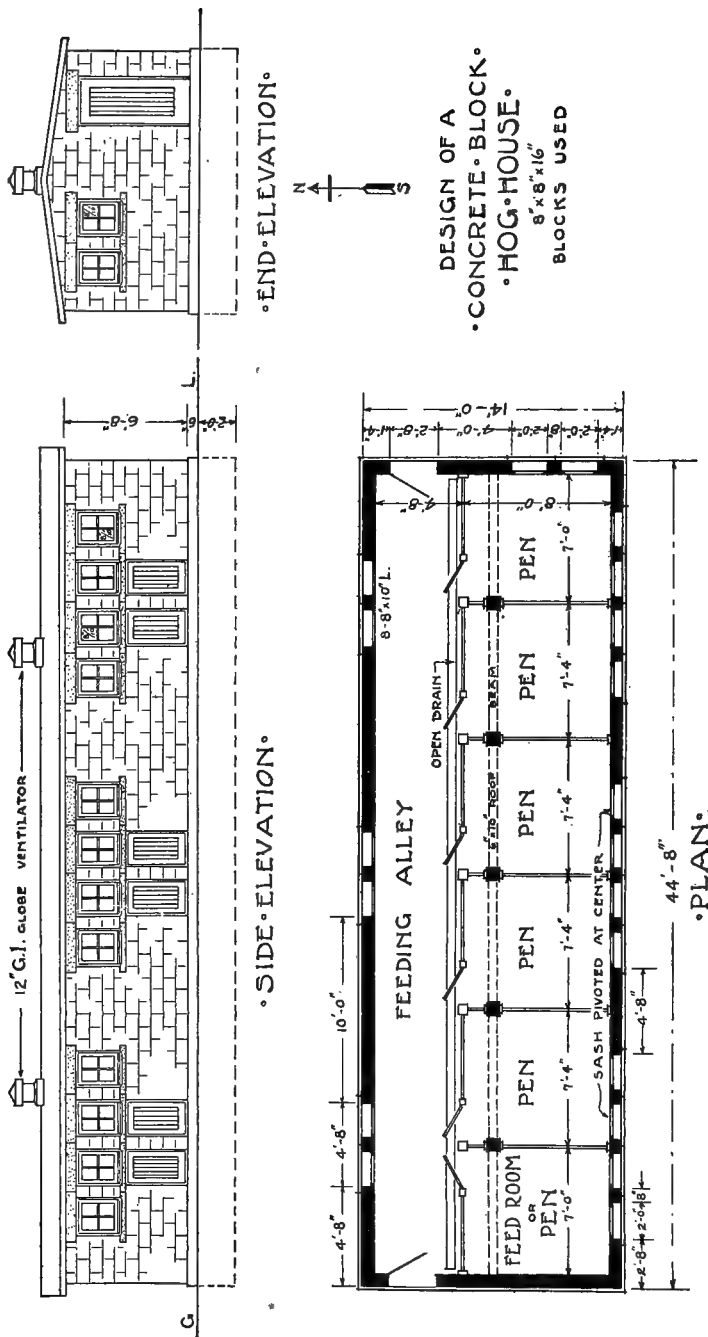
A Fine Pen Hog House of Concrete Block. Many hog raisers use houses of this type for early farrowing, housing later litters in less substantial structures.
